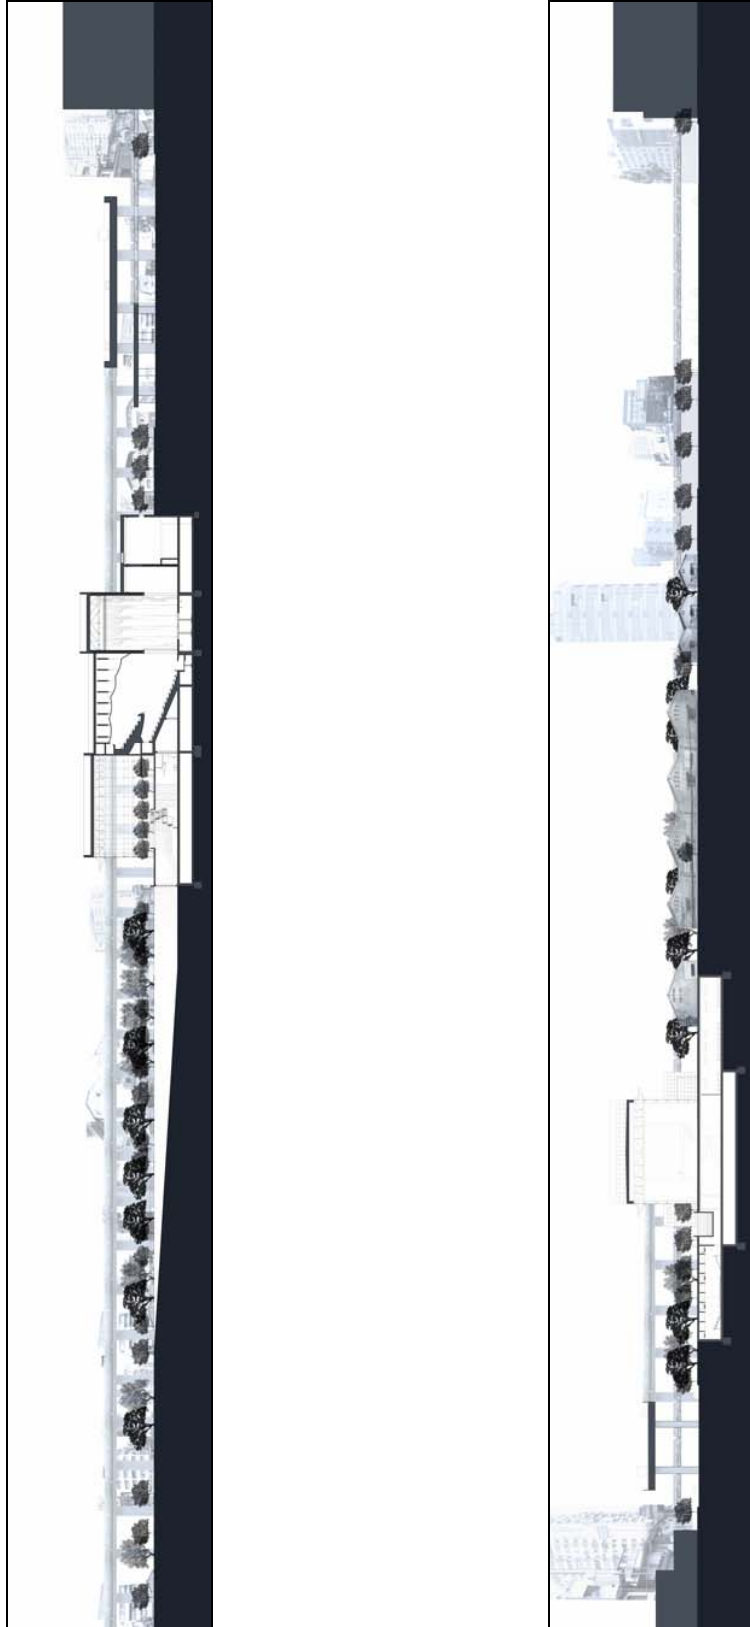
Site sections.Top: east-west section; Bottom: north-south section
